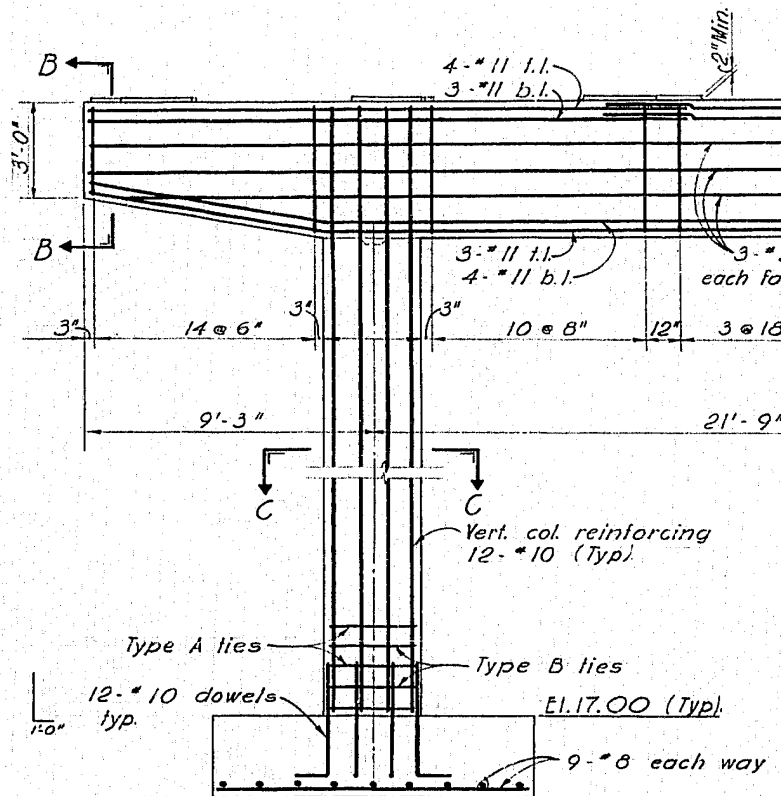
Interior Bents Connections - Bents Columns to spread footing, inadequate reinforcing embedment
